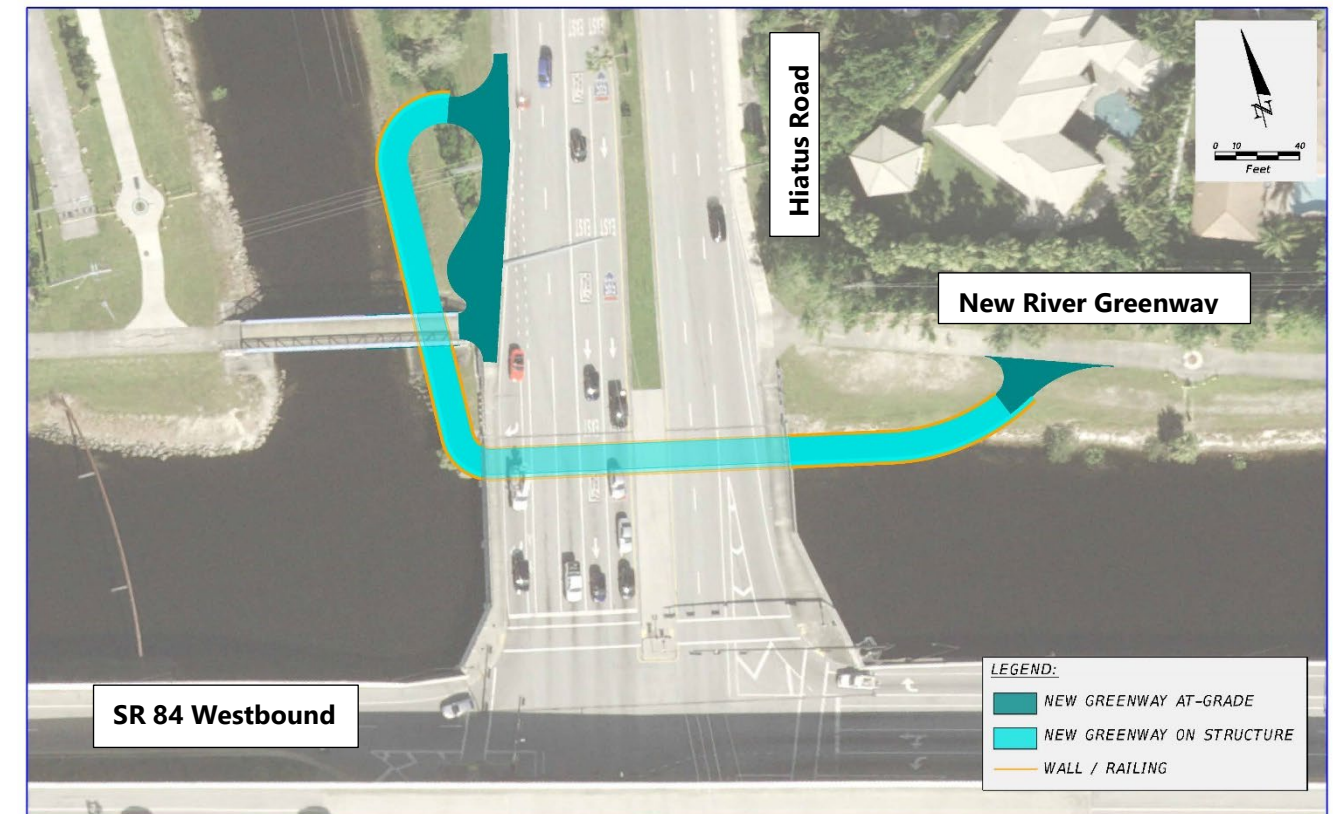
New River Greenway Overpass Crossing Concept Plan Option B
